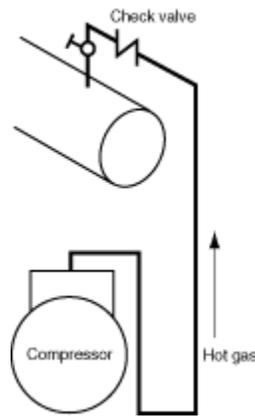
F03D Use of check valve in hot gas line with condenser above the compressor if compressor is in cooler location than condenser.
